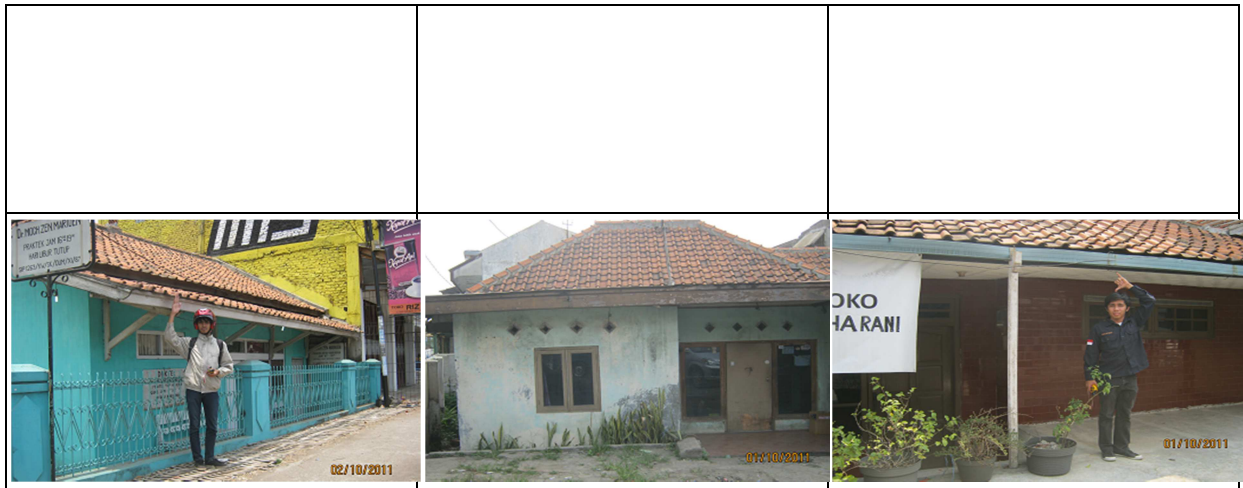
Impact of land subsidence on tilting and damaged houses in Bandung Basin
